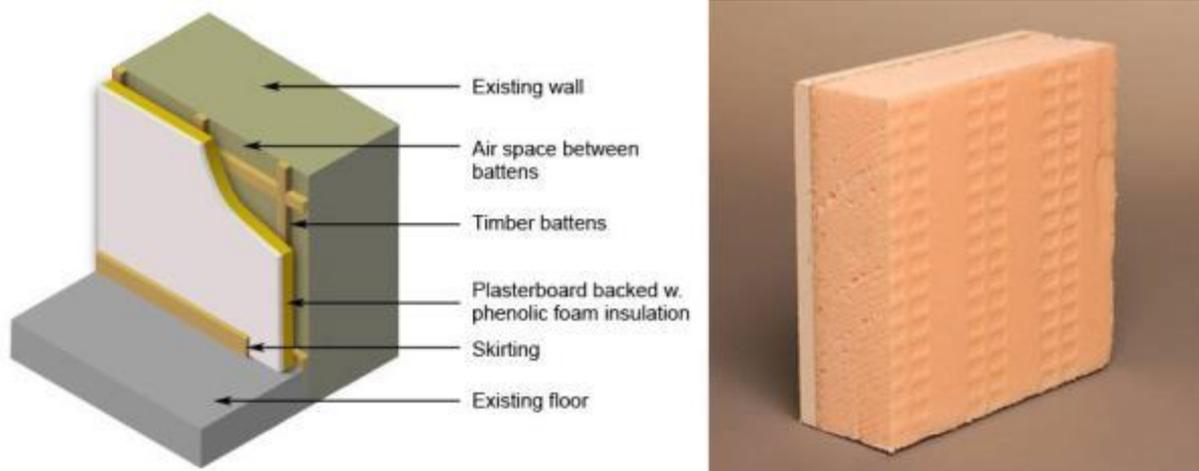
Phenolic foam insulation bonded to foil-backed plasterboard is fixed to timber studwork, leaving air cavities in between the studs and between insulation and masonry.
